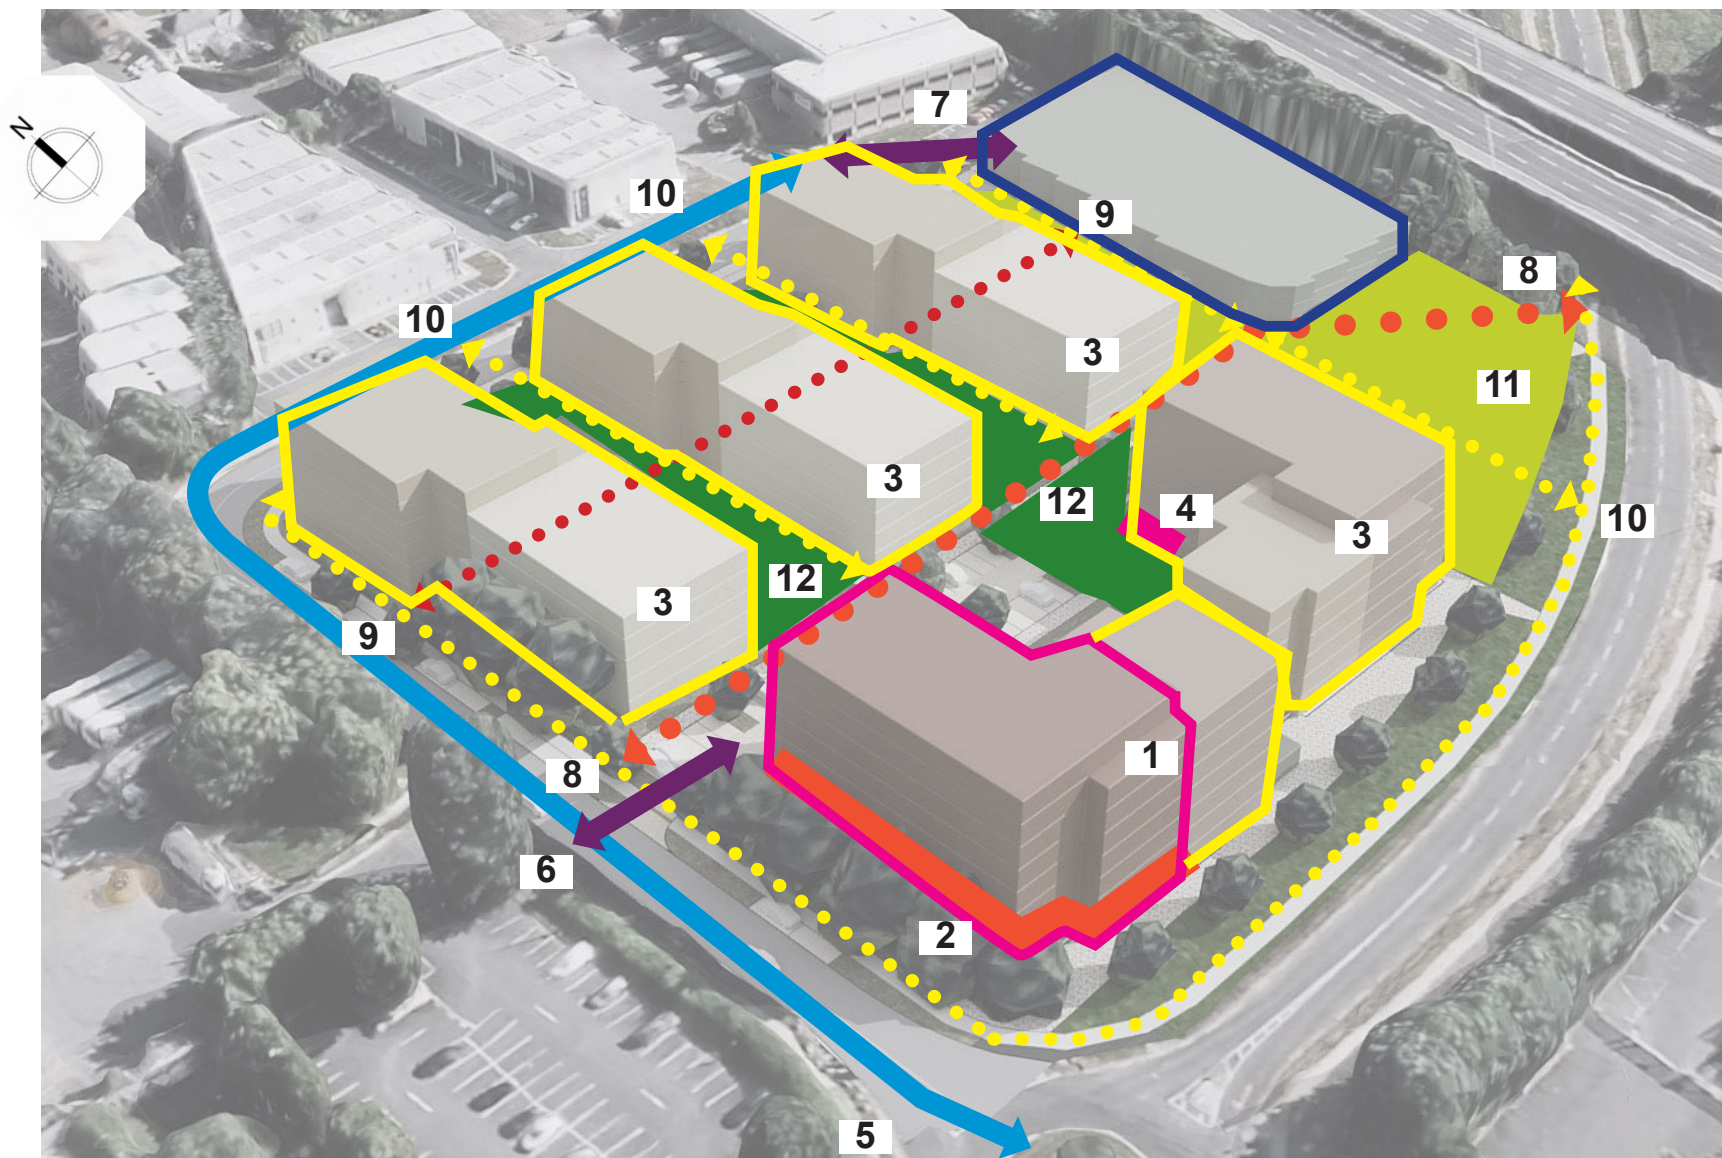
Site Strategy Massing as presented to Fingal Co. Co. at the Section 247 meeting 16th April 2025.
